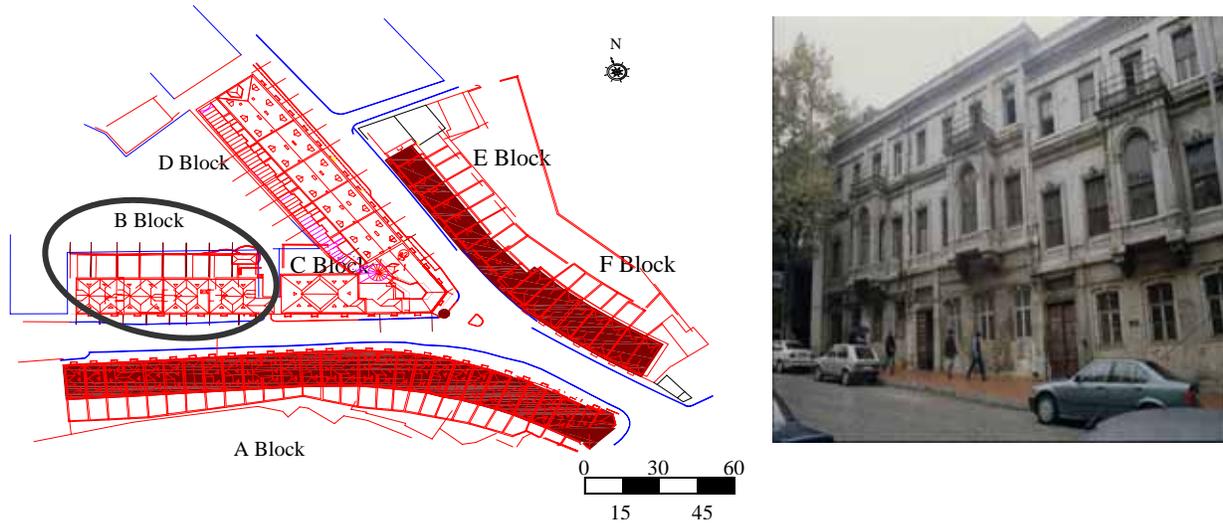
a) The site general layout plan of Akaretler Row Houses, b) The façade of the Block B.
